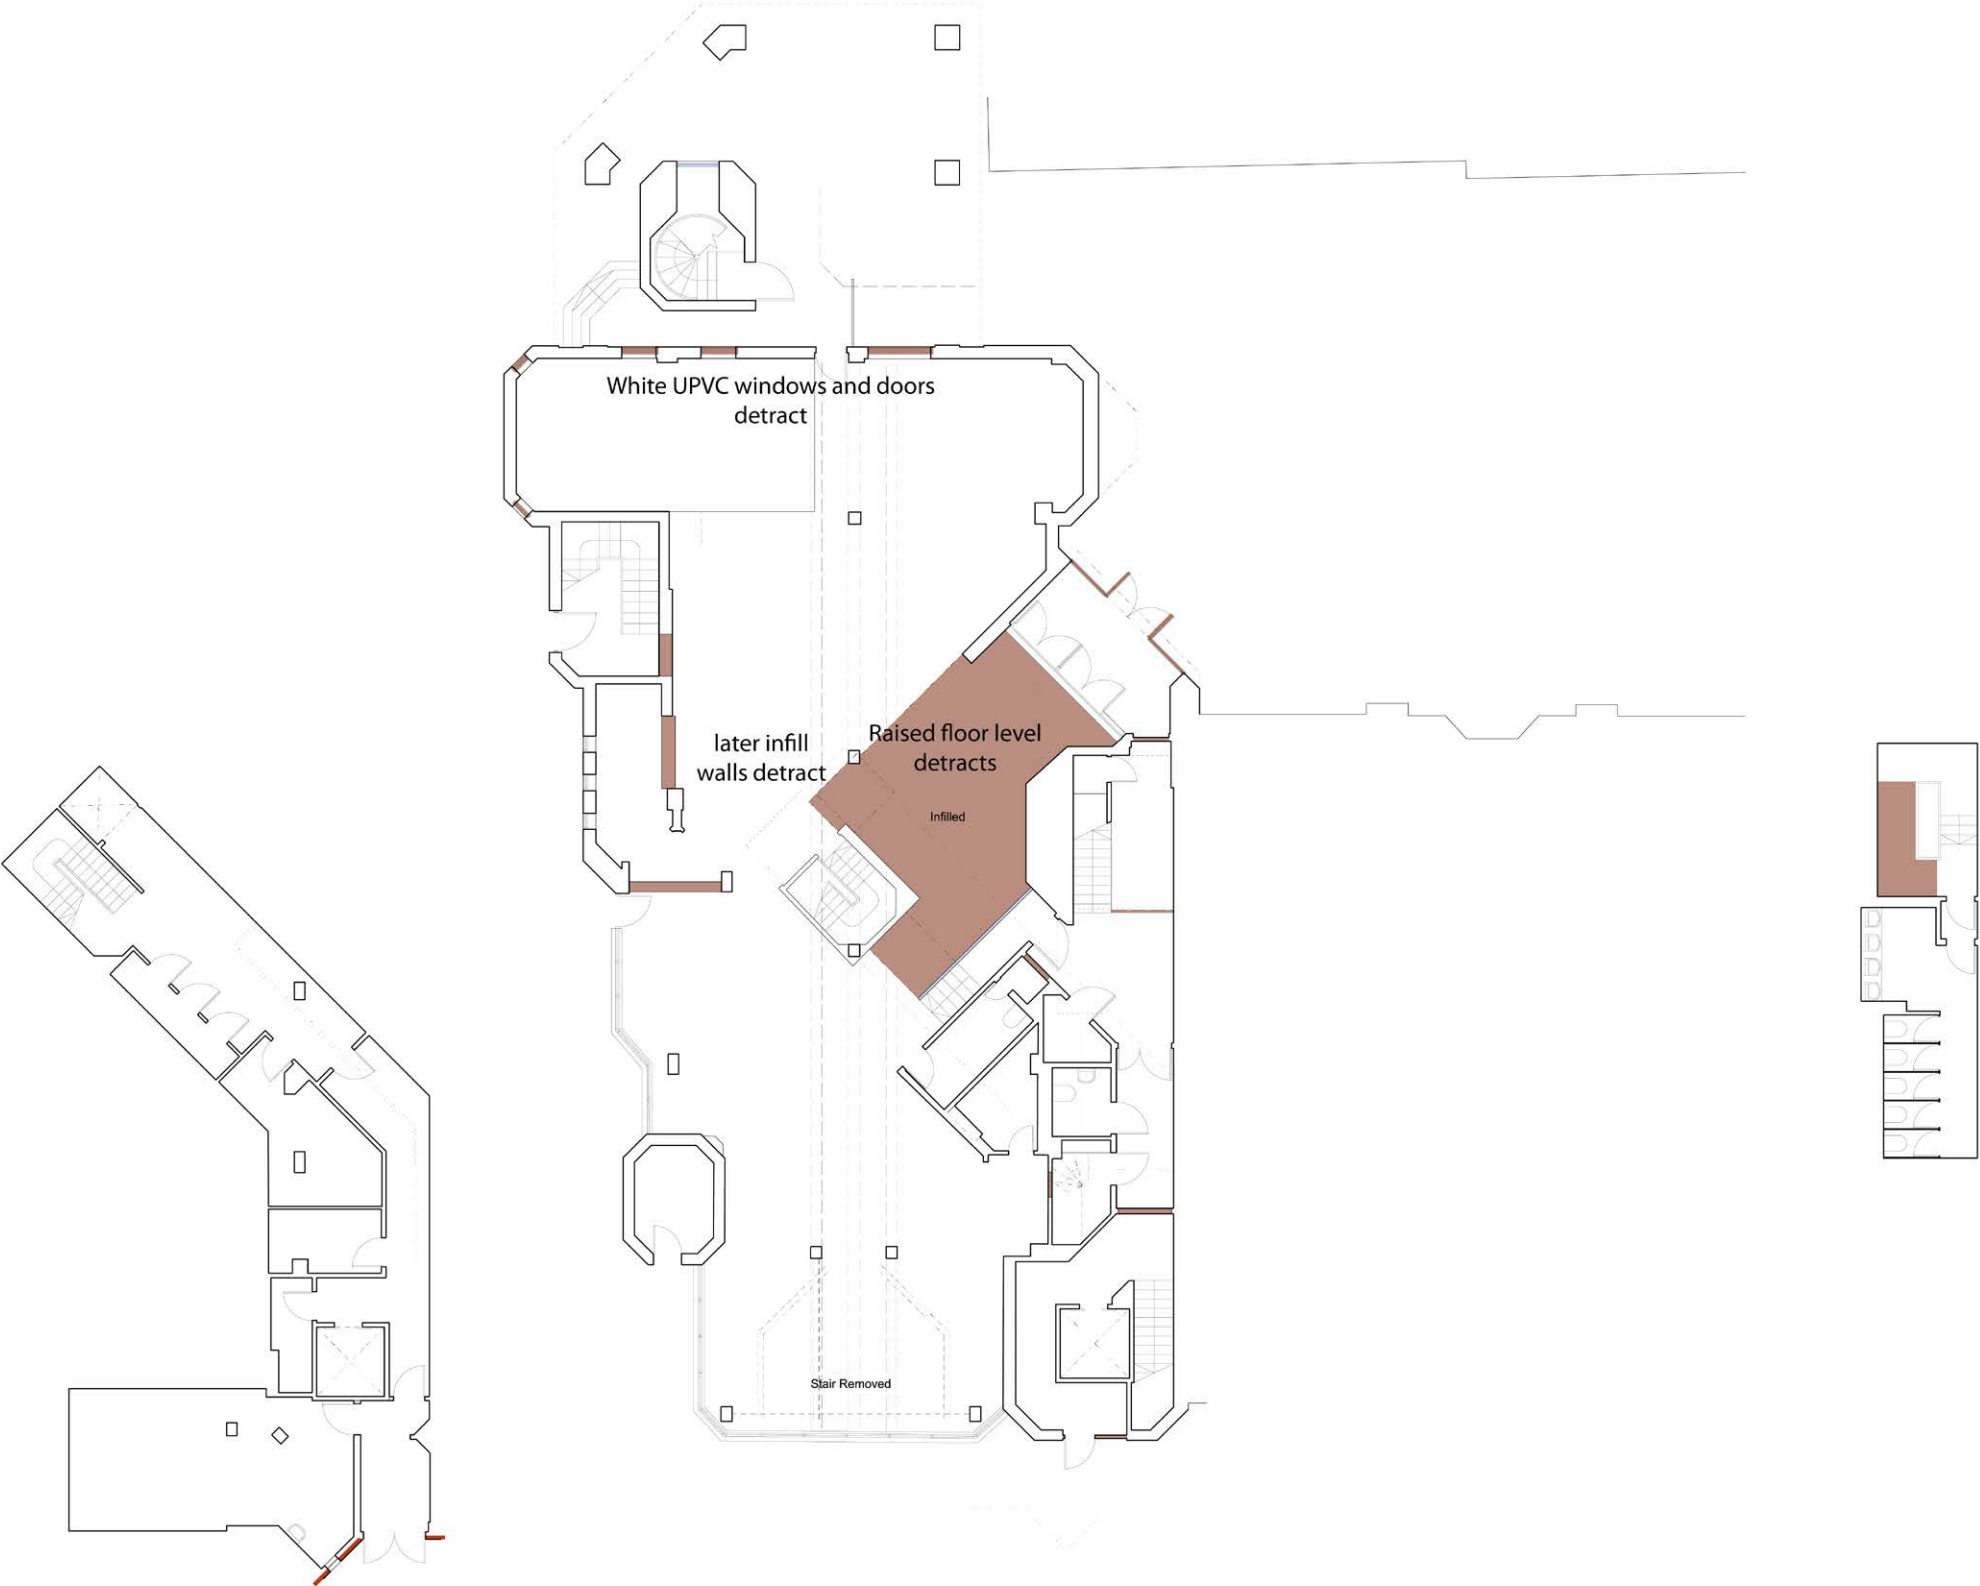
Ground floor detracting fabric [Ian Chalk Architects]
